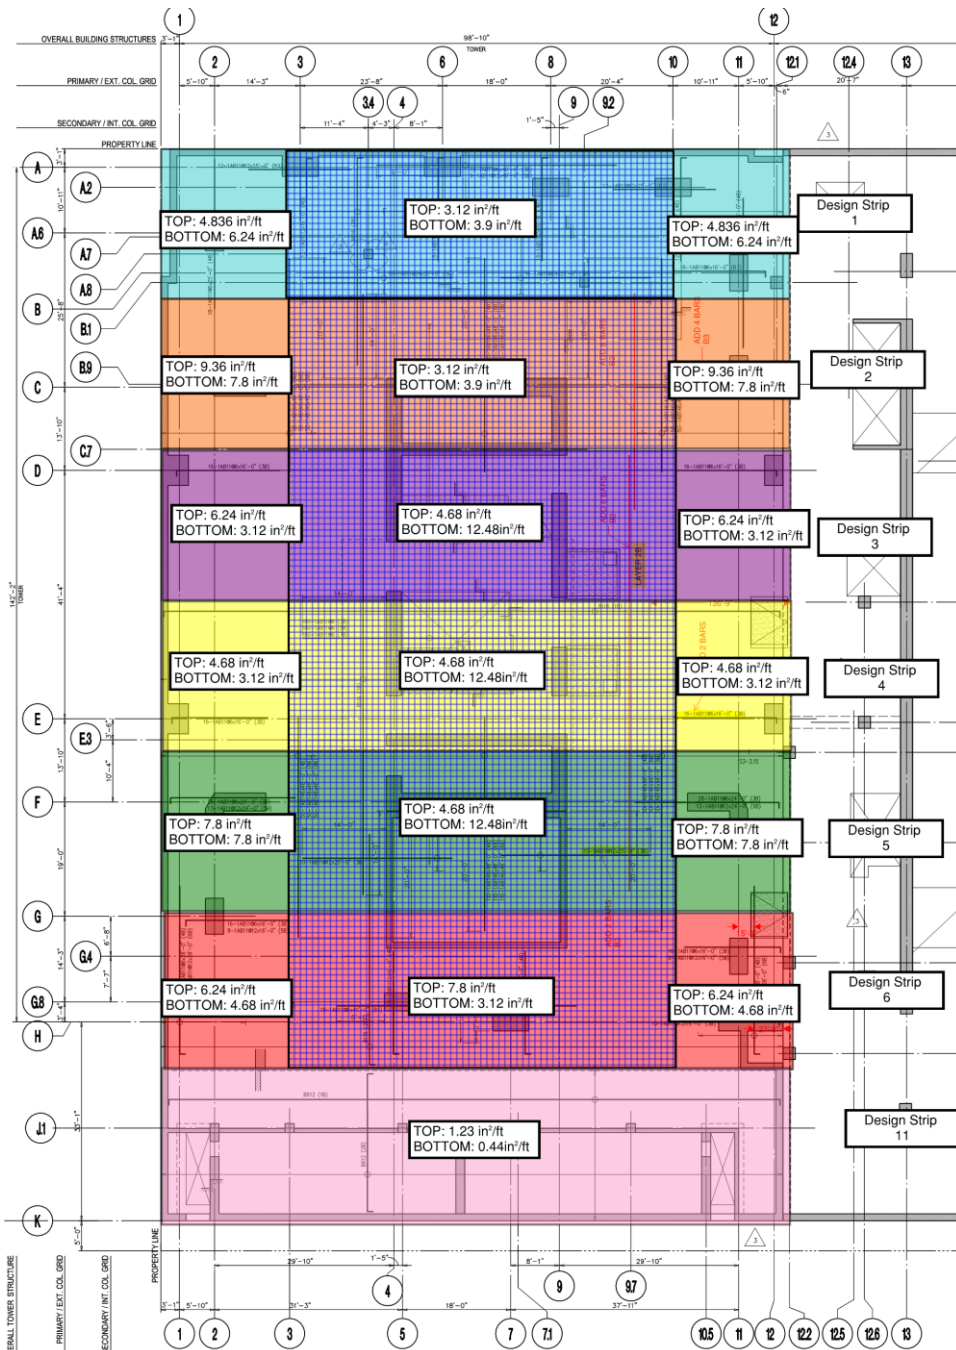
Top and Bottom North – South Reinforcement Area per Foot of Slab
